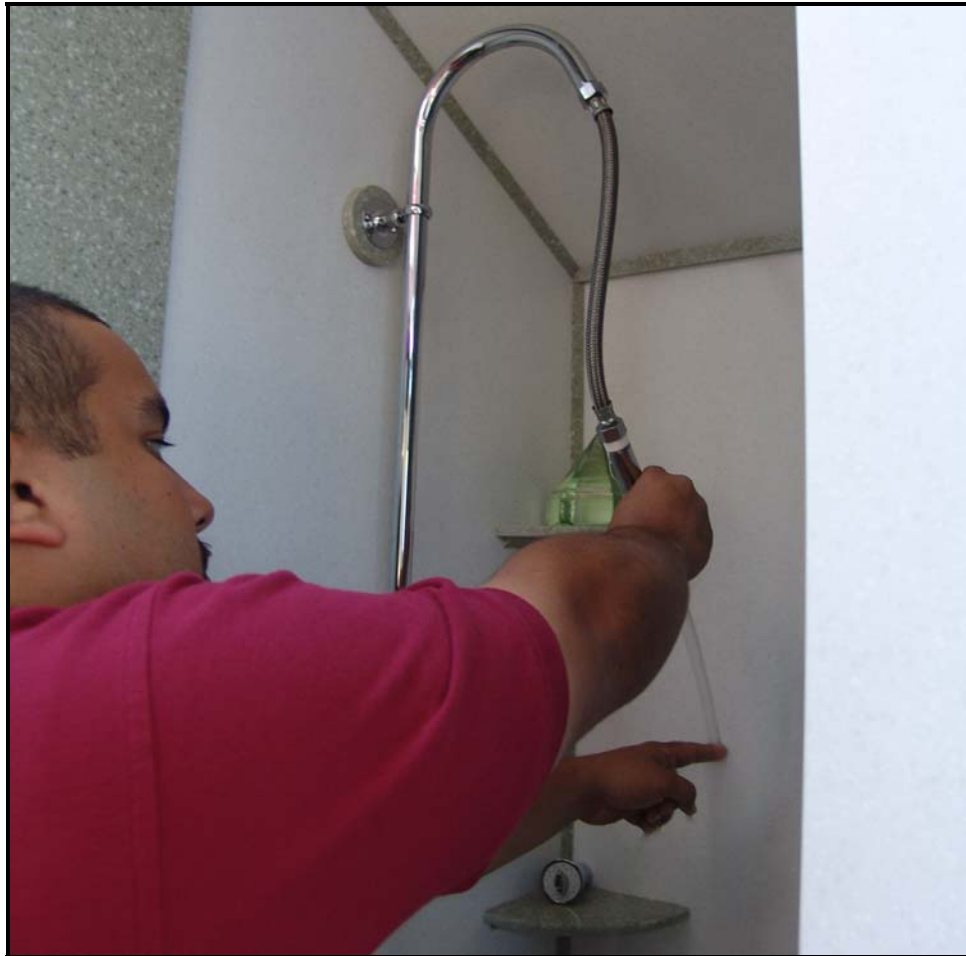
TAMU team member removing cold water from the hot water pipeline for the shower test (photo by John Peters).
